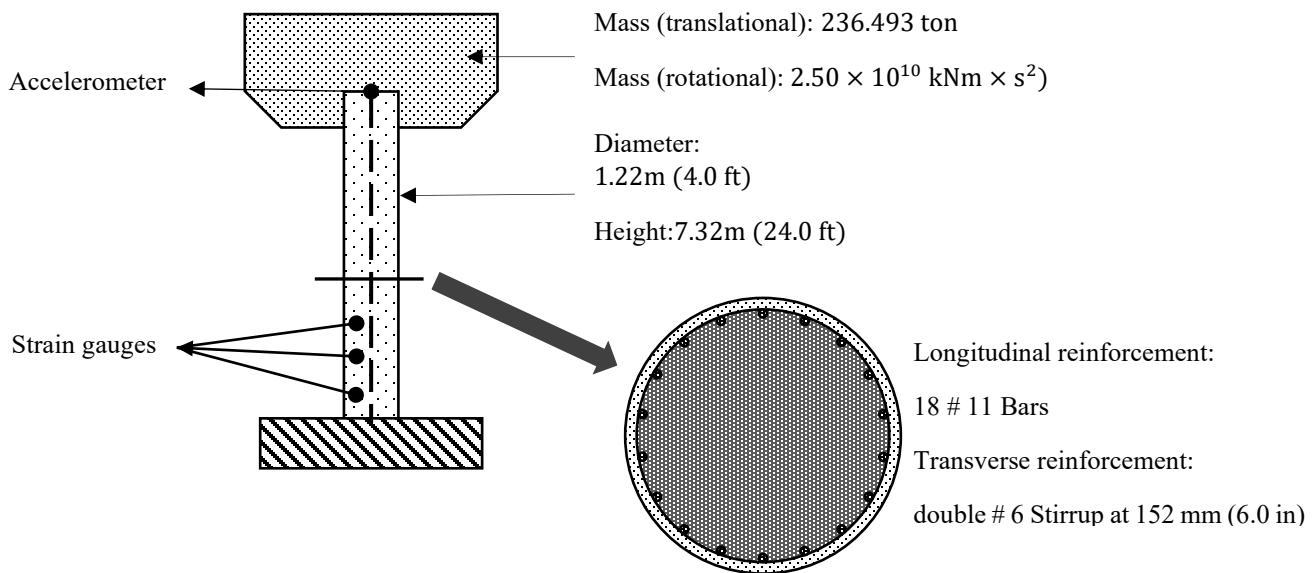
Schematic view of the full-scale RC bridge pier column tested on the shake-table
